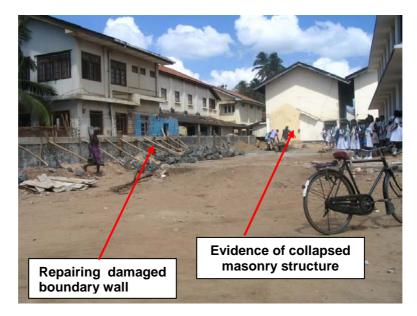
School in Matara (Cat. D) suffered minor damage with damage to a masonry structure attached to a school building and to the boundary wall under repair
